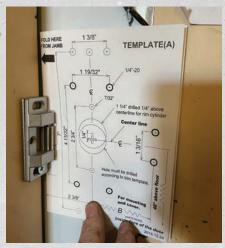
The strike was installed using the bottom screw hole left by the previous installer. Next, the author taped the template to the door and the cylinder hole, and one mounting screw hole was drilled.
